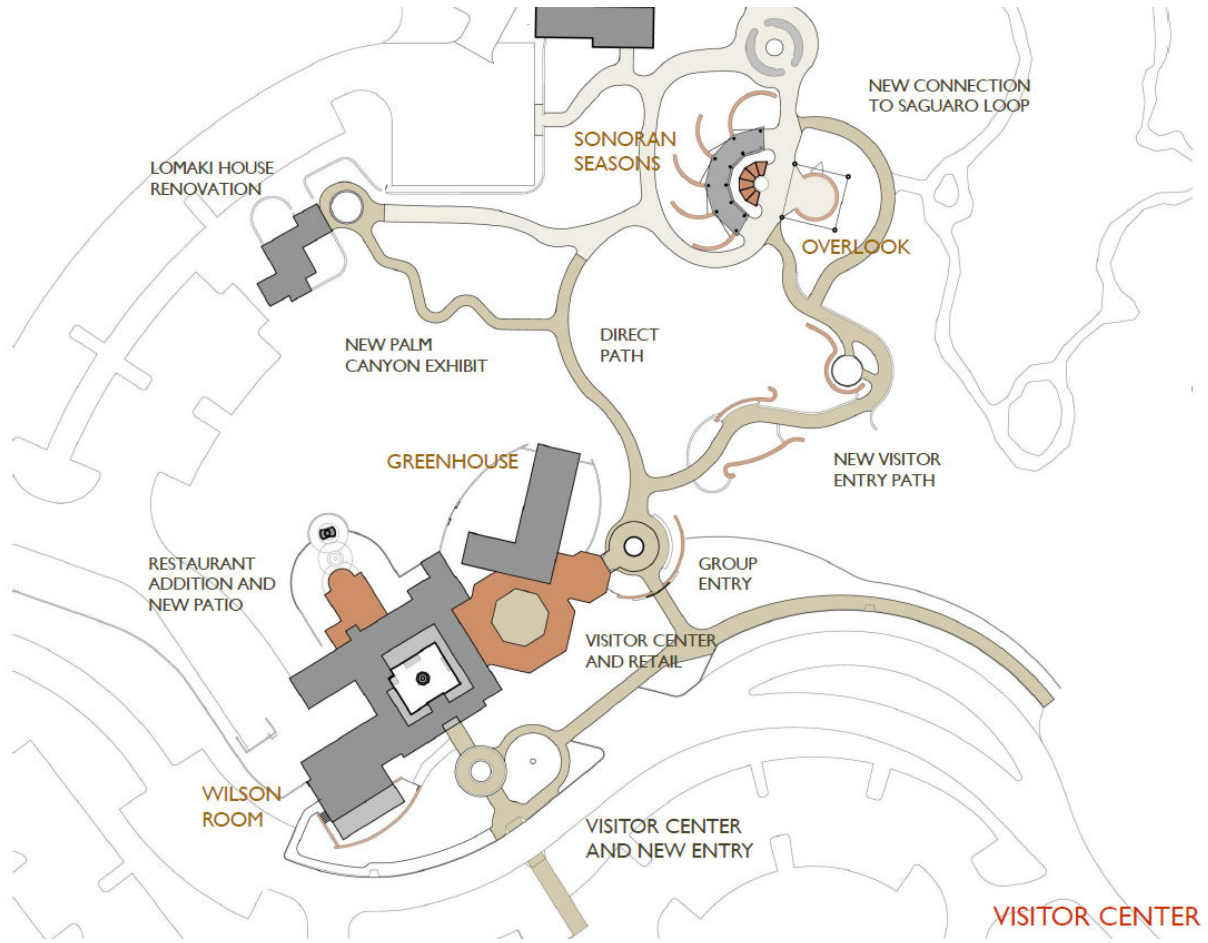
B: Visitor Center Conceptual Floor Plan
